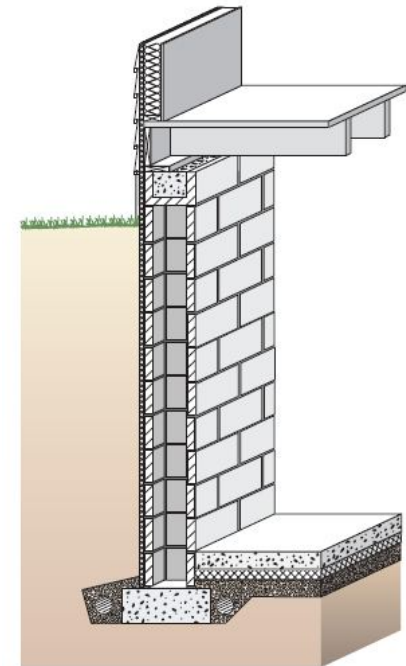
Concrete Masonry Basement Wall with Exterior Insulation
